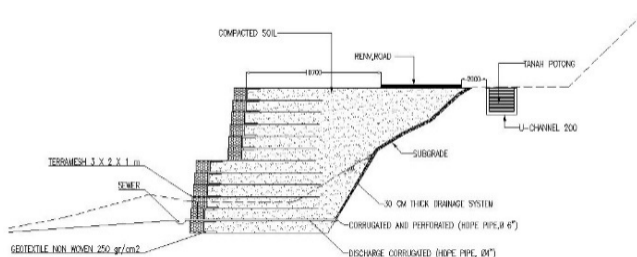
Typical Cross Section of Reinforced Soil Structure Bukit Kemuning Road in Batam
